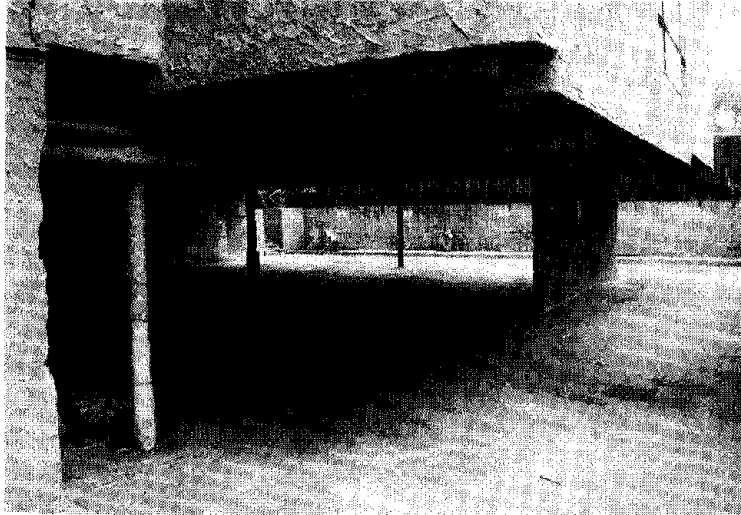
Basement Floor of an Apartment in Hollywood (To provide require parking spaces required, number of columns and walls at the basement floor is small)
